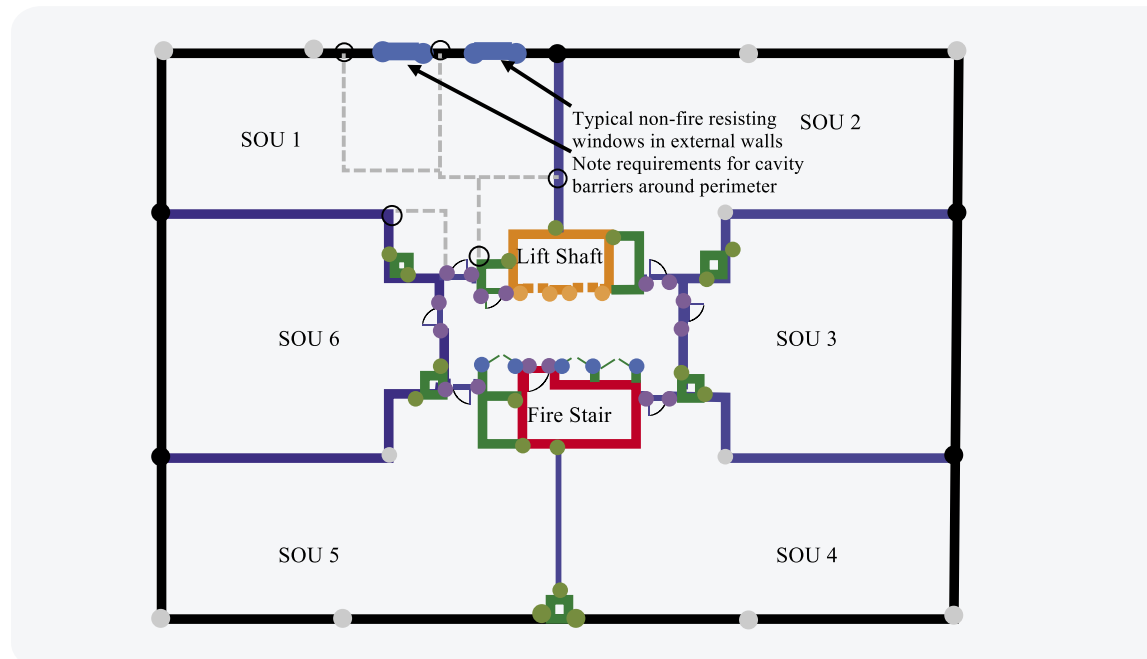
Horizontal section of an apartment building showing typical cavity barrier positions.
